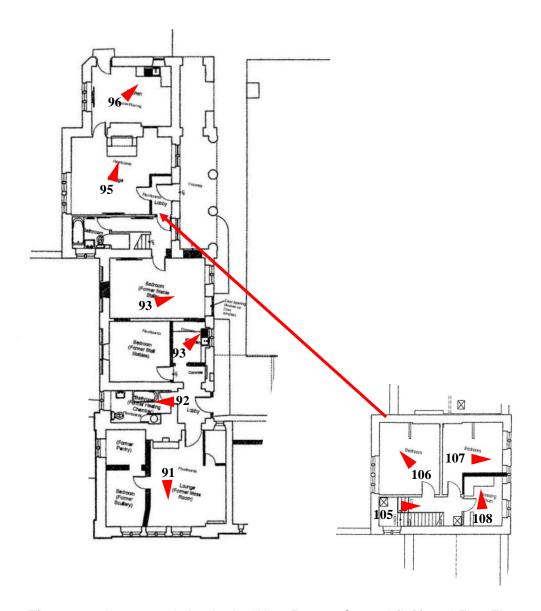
Accommodation in the West Range. Ground (left) and First Floor
